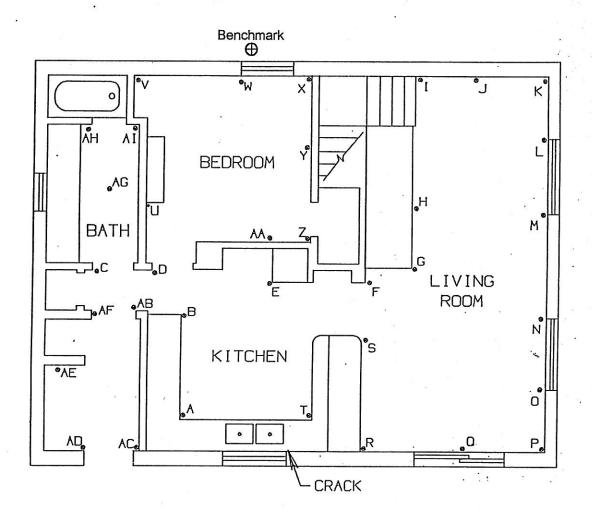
FLOOR PLAN OF HOUSE ON RISE RD. SHOWING LOCATIONS OF LEVEL MEASUREMENTS
